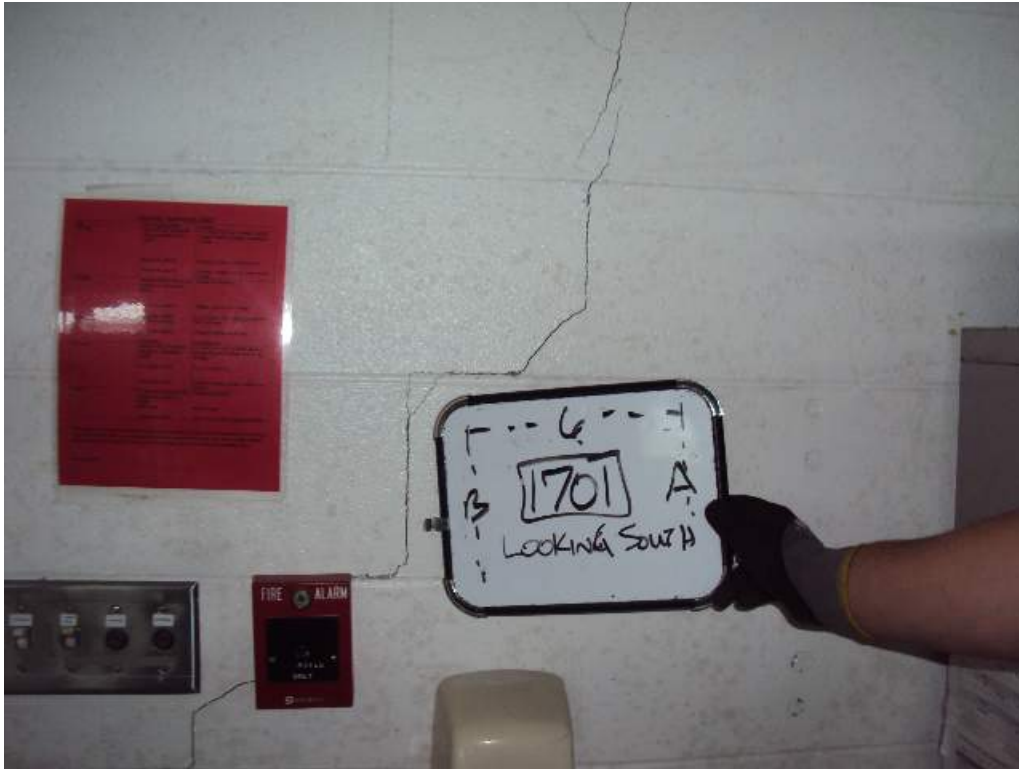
1st Floor – Room 1701– Along col line 6 between A and B– Looking South– Stair step crack in CMU wall
